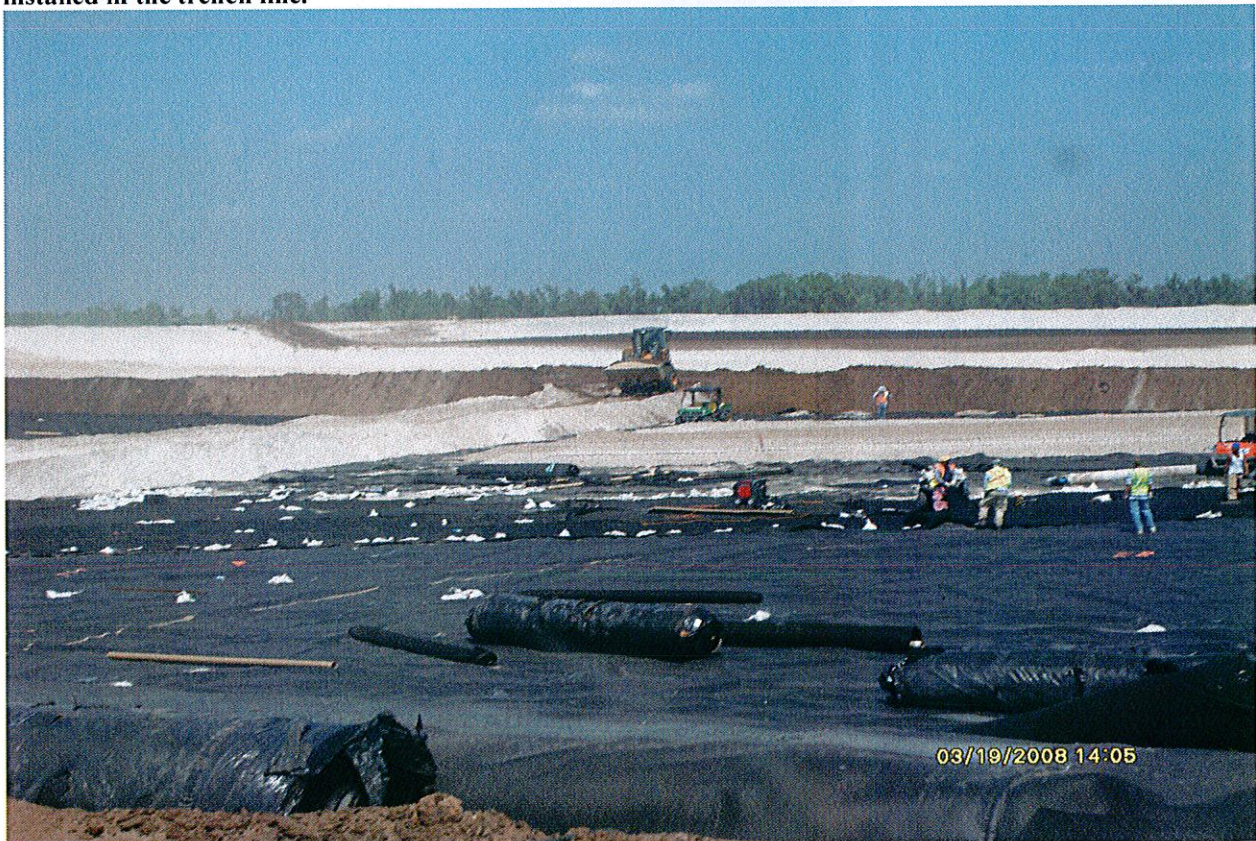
March 19, 2008 Section 9 Construction Photo – This photo shows the primary geocomposite being placed and sewn prior to placing the protective cover.
